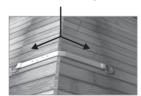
Position the anchor on the roof and alternately insert the nails.
